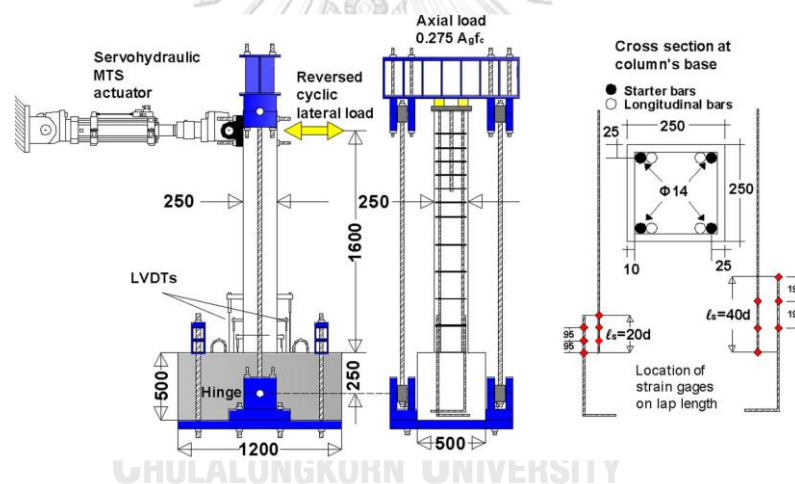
Structural details of columns tested by Bournas and Triantafillou [66].
